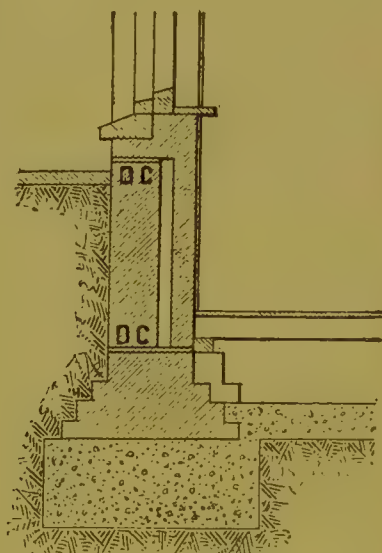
Method of preventing dampness of walls. Letters *DC* denote location of damp-proof courses. (*Munson.*)
